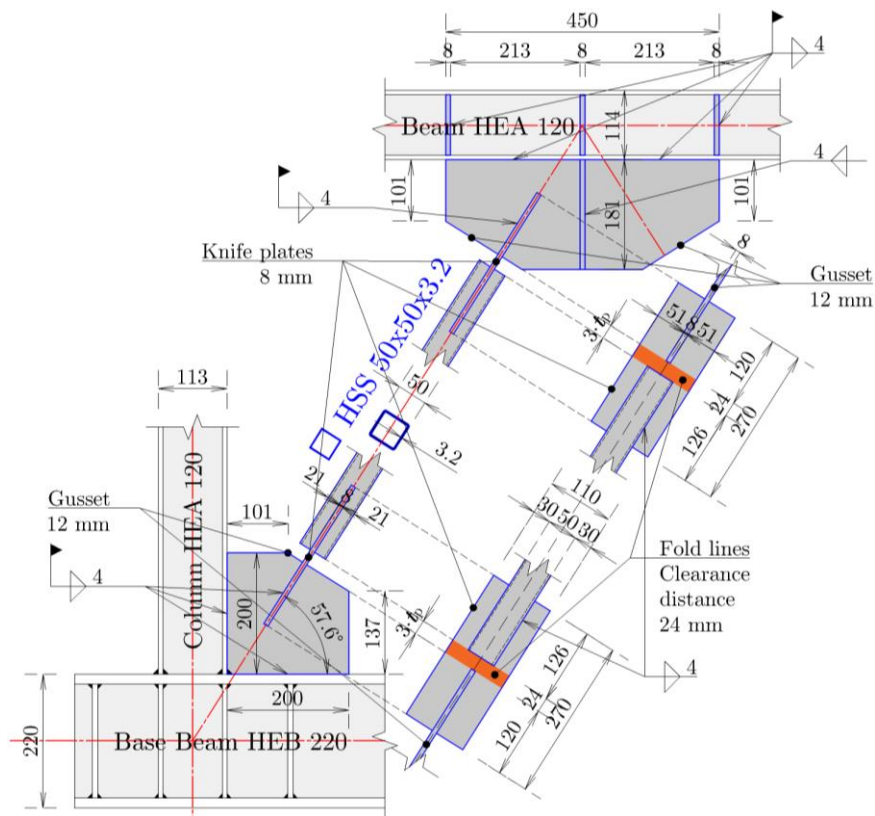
Details of diagonal element connections, gusset plates, knife plates, clearance distances and welds
